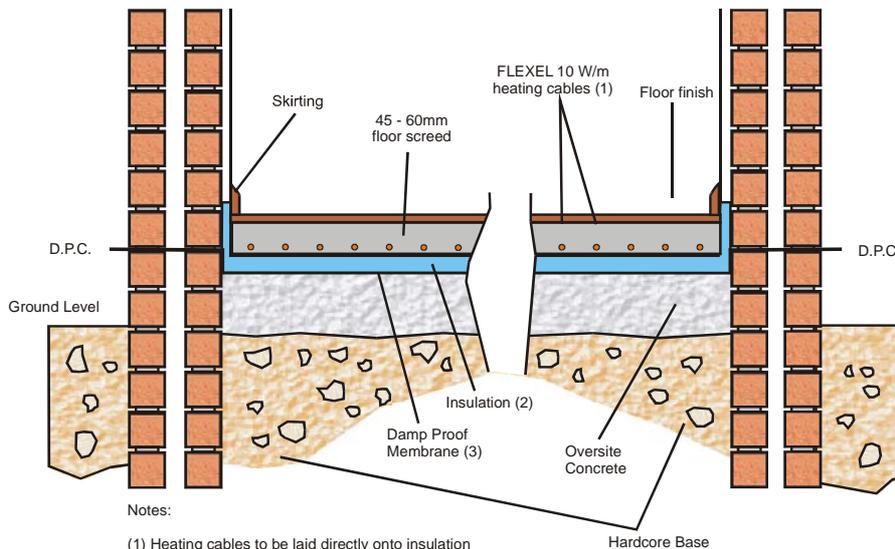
Ground Floor Detail For storage (Accumulative) Heating
